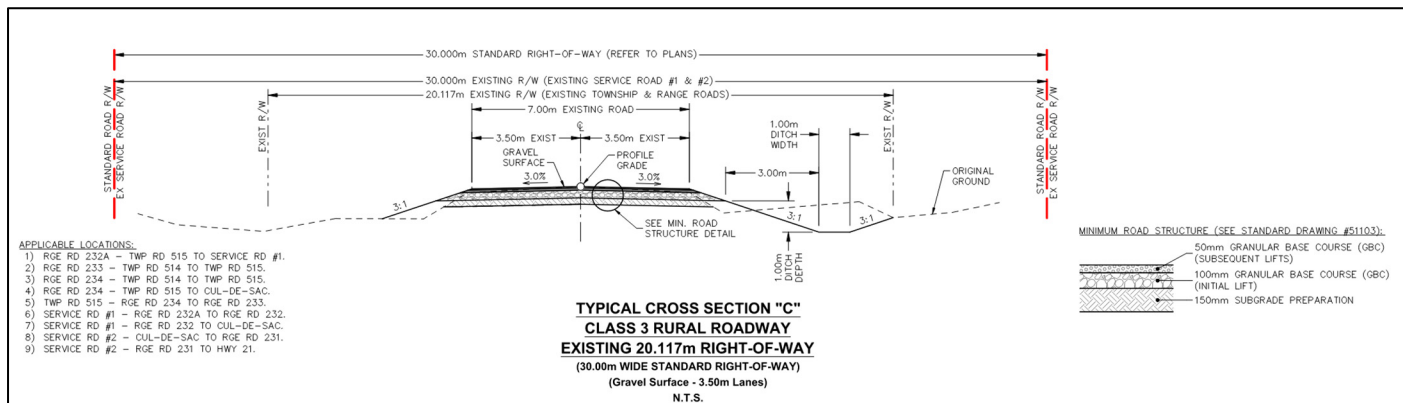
Cross Section C – Class 3 Rural Roadway (Gravel)
